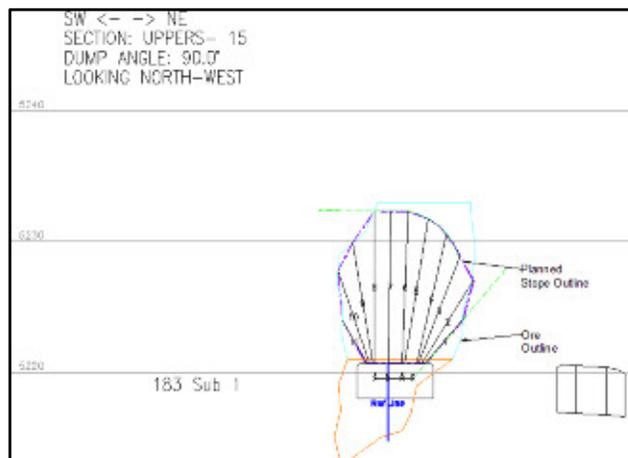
Typical Upper Ring Layout 183-Z1-161
